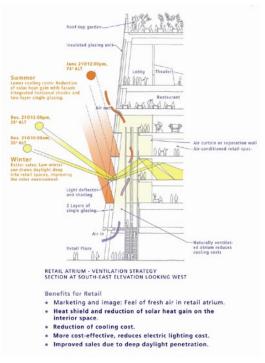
Anyang retail atrium, diagrammatic section at south-east elevation
